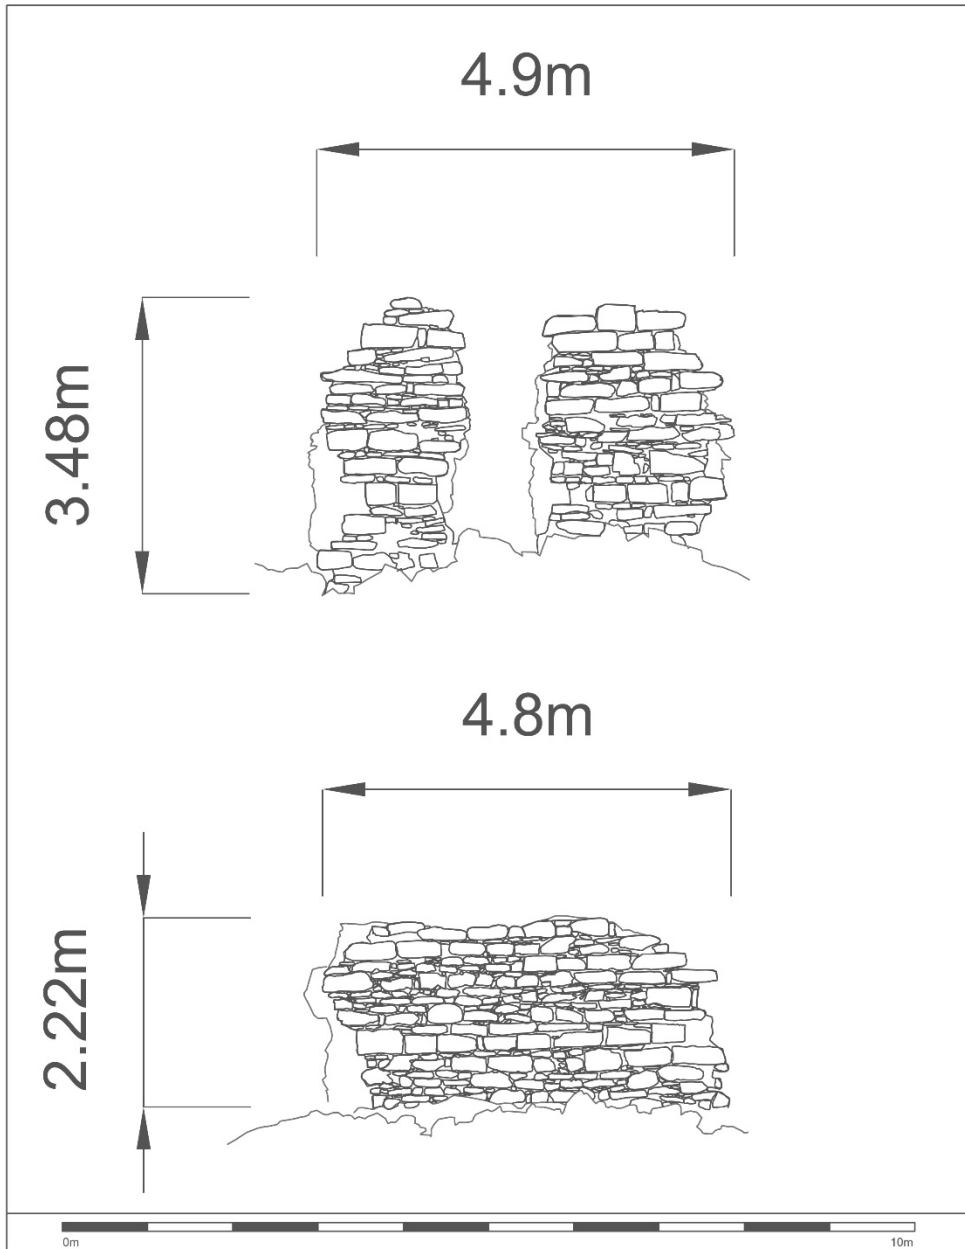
External elevations of the north-west (top) and south-west (bottom) walls of the collapsed or unfinished signal tower at Lenadoon Point Signal Station.
